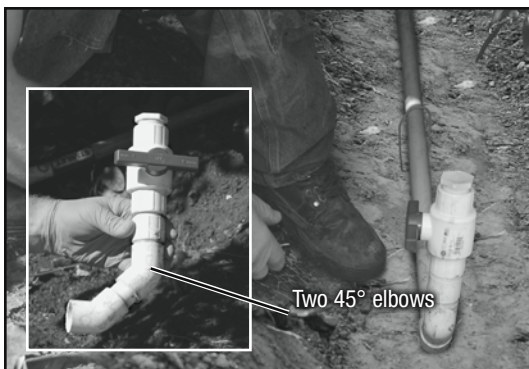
Install a sweep ell (or two 45° elbows) and a ball valve with a threaded plug
